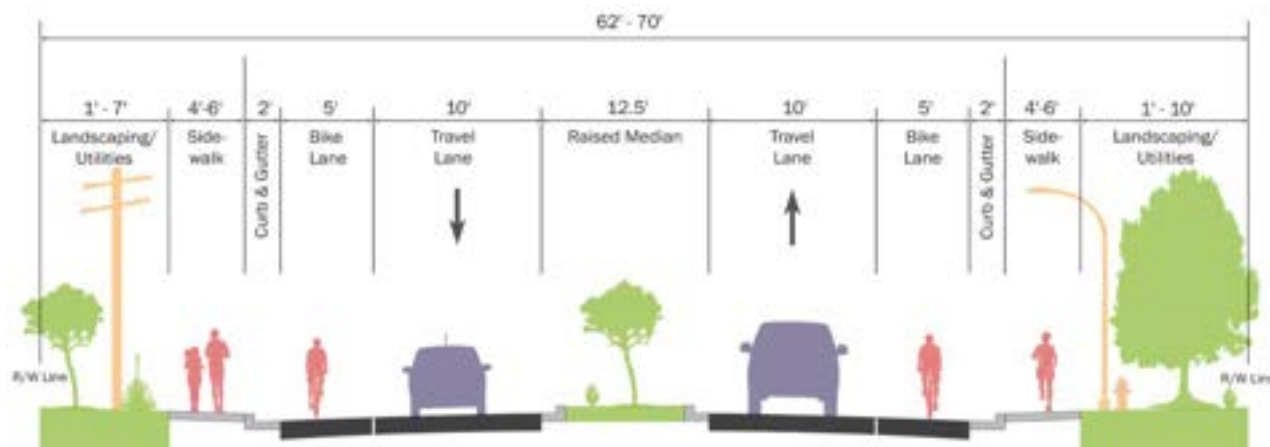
Alternative A – 10-ft Lanes with Raised Medians Typical Section
